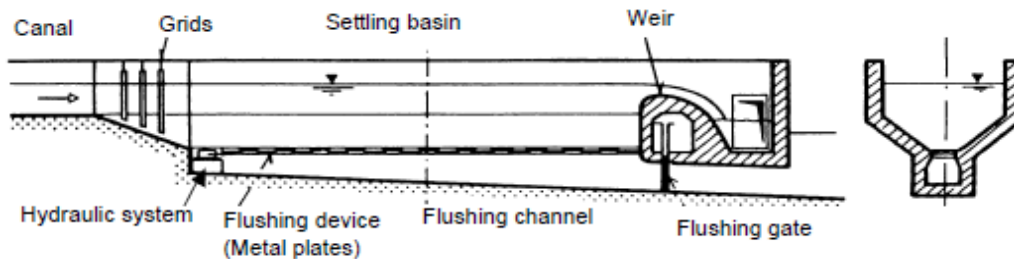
Bieri Type settling basin's profile and cross-section view (Andaroodi, 2005)
